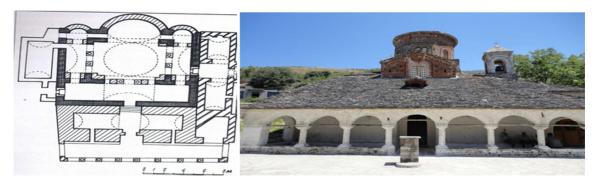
The plan and photo of Saint Mary church in Labovë e Kryqit [6].
